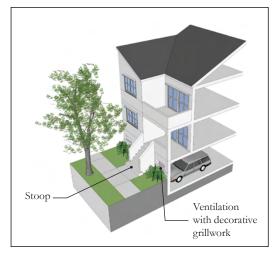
Semi-depressed parking should be screened with architectural elements that enhance the streetscape such as stoops, porches, or balcony overhangs.
